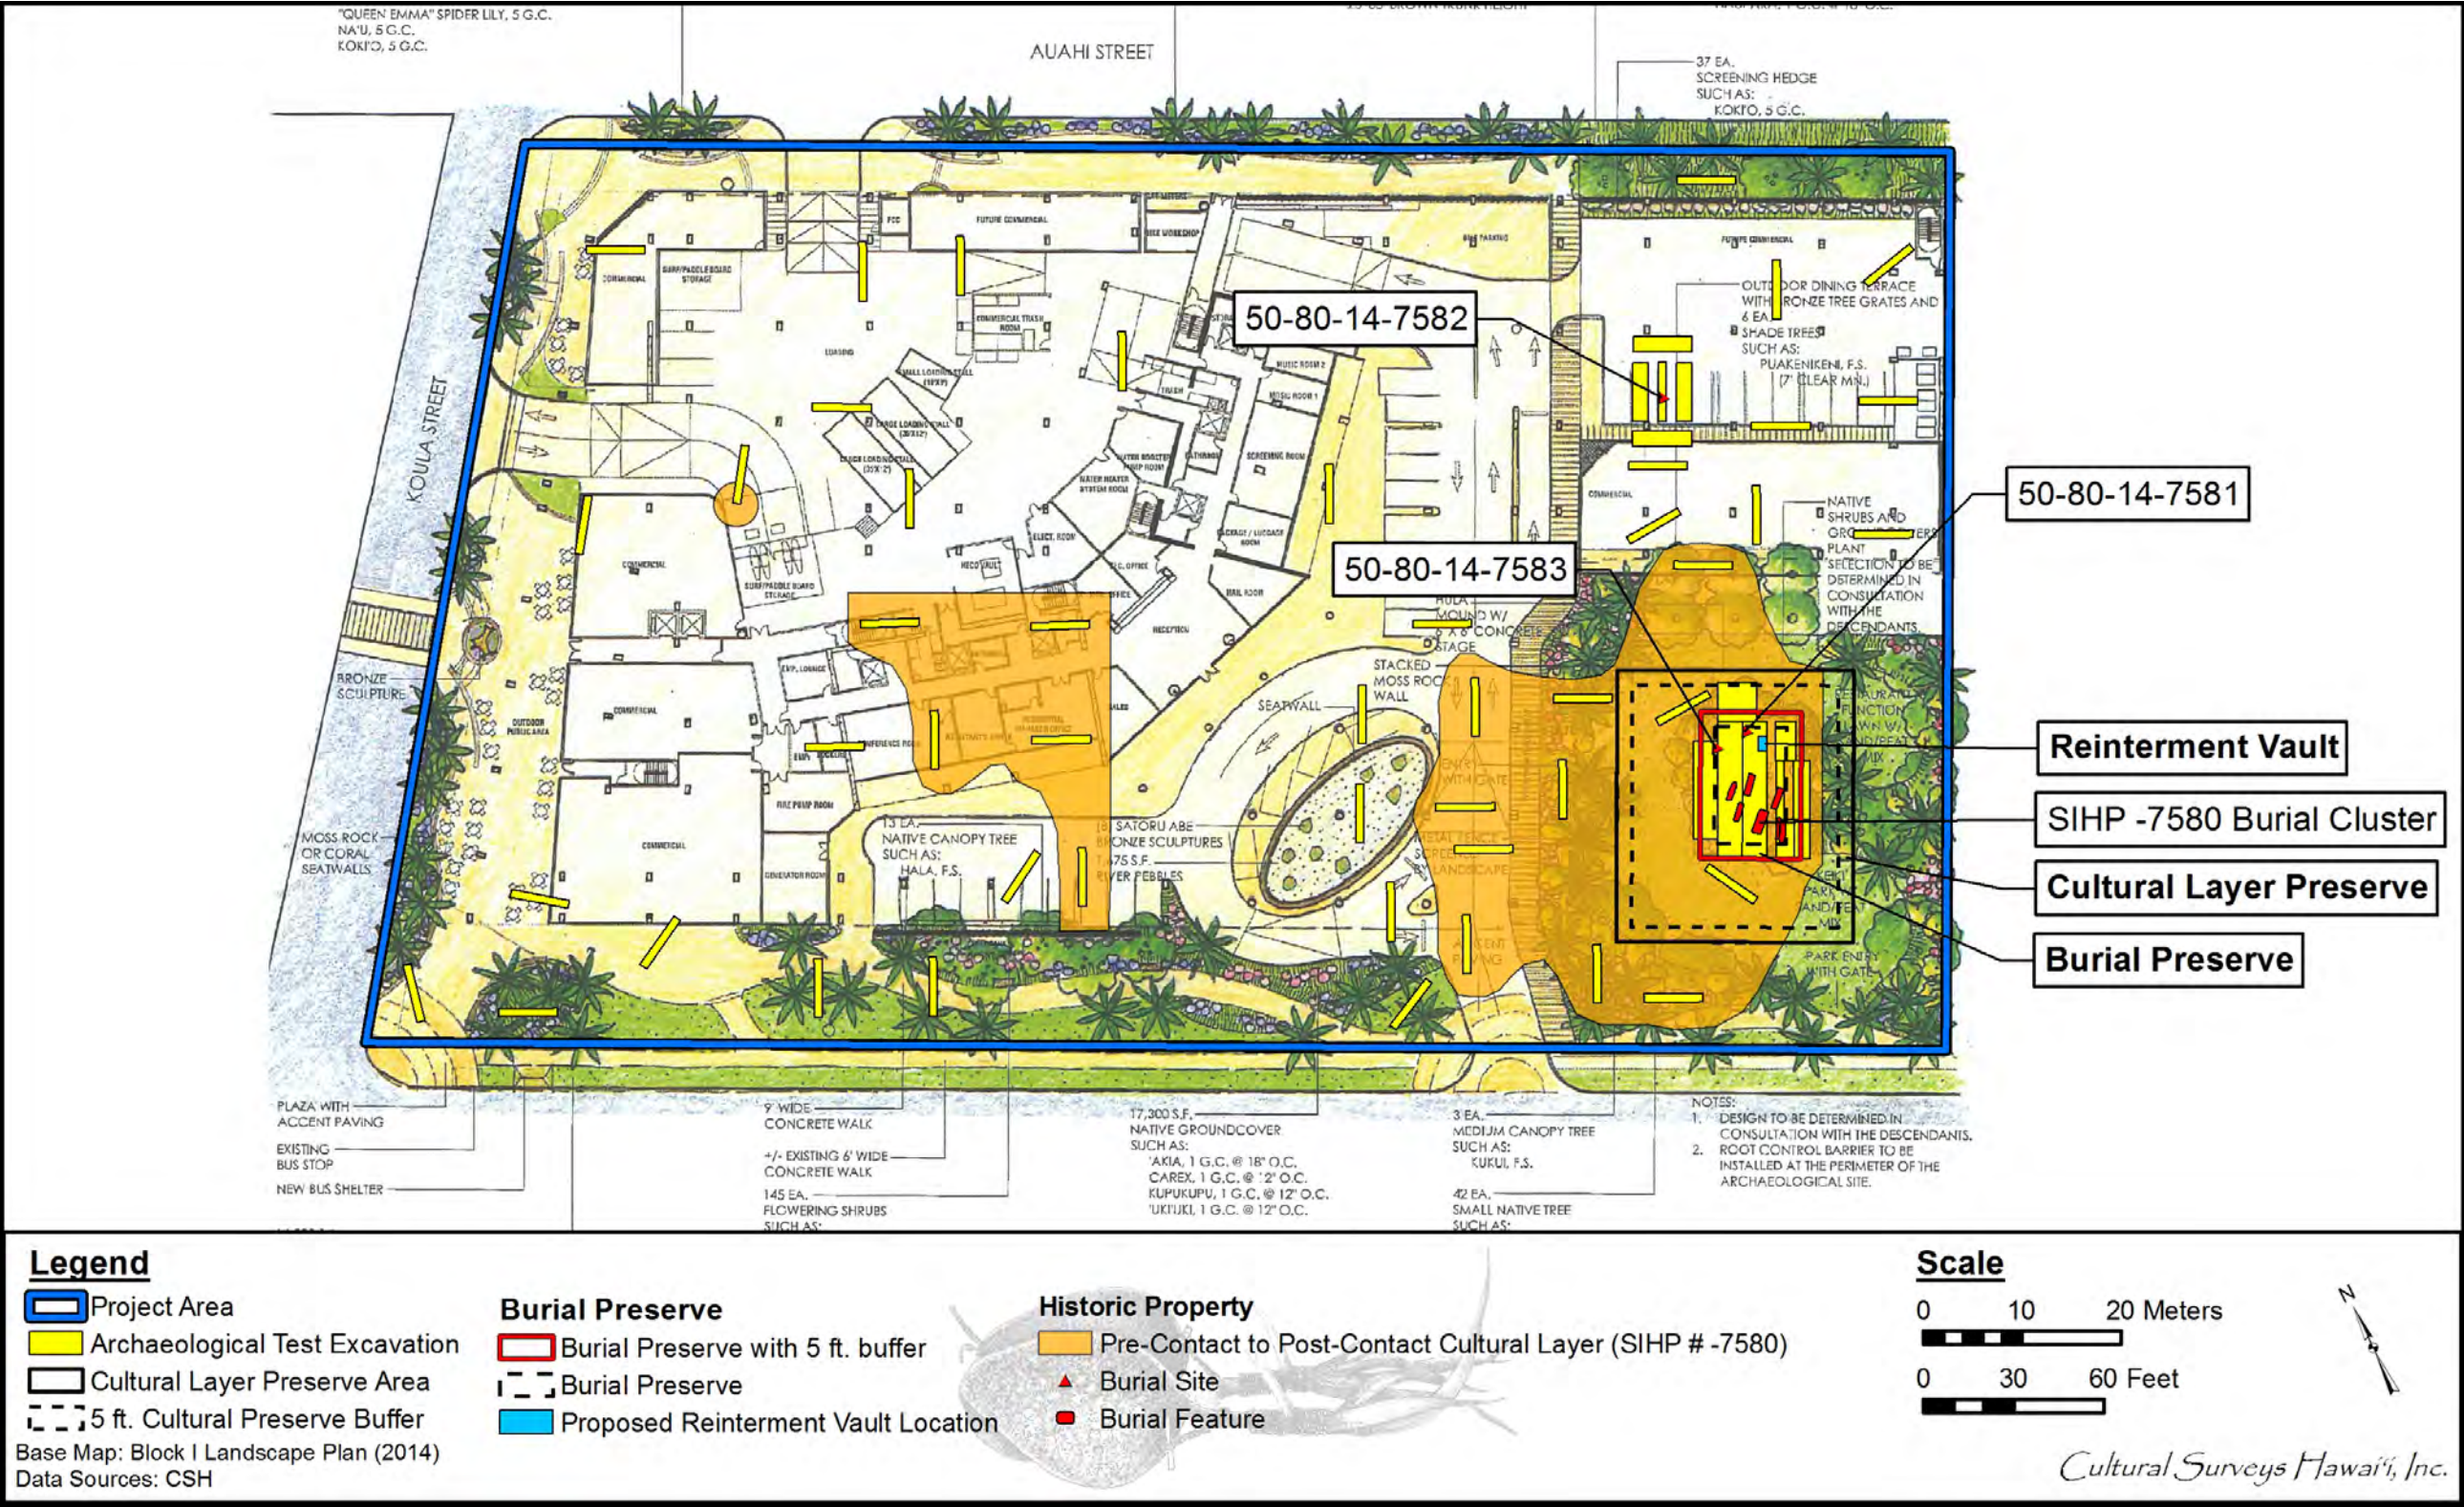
Block I Landscape Plan detailing proposed redevelopment in relation to the proposed archaeological preserve, burial preserve, and reinterment vault (source: MK 2014)
